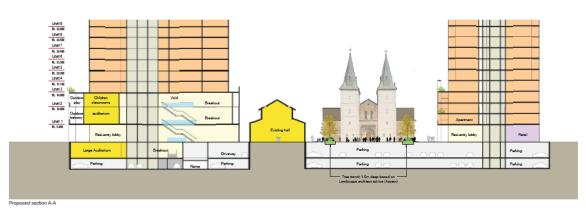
Section showing development option 1 (Source: Planning proposal)
